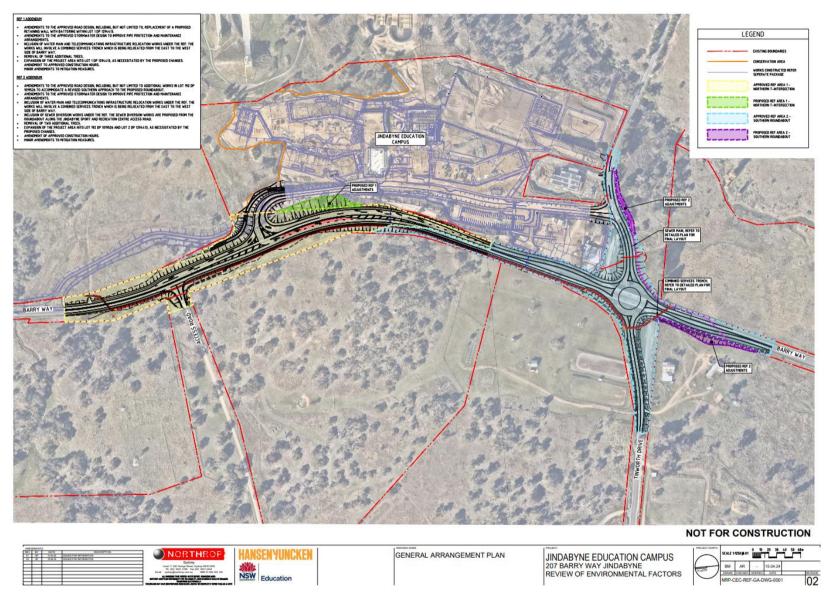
General Arrangement Plan REF 1 & REF 2 – The REF 2 Boundary (existing area shown in blue & additional area shown in purple)
